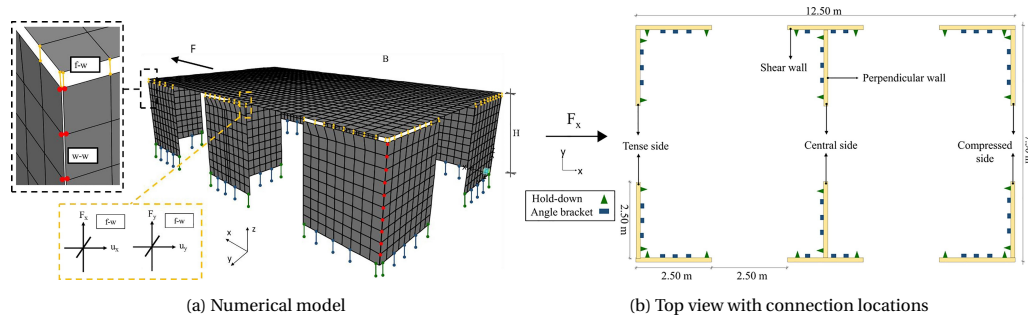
3D view and top view of the one-storey CLT structure [45]
